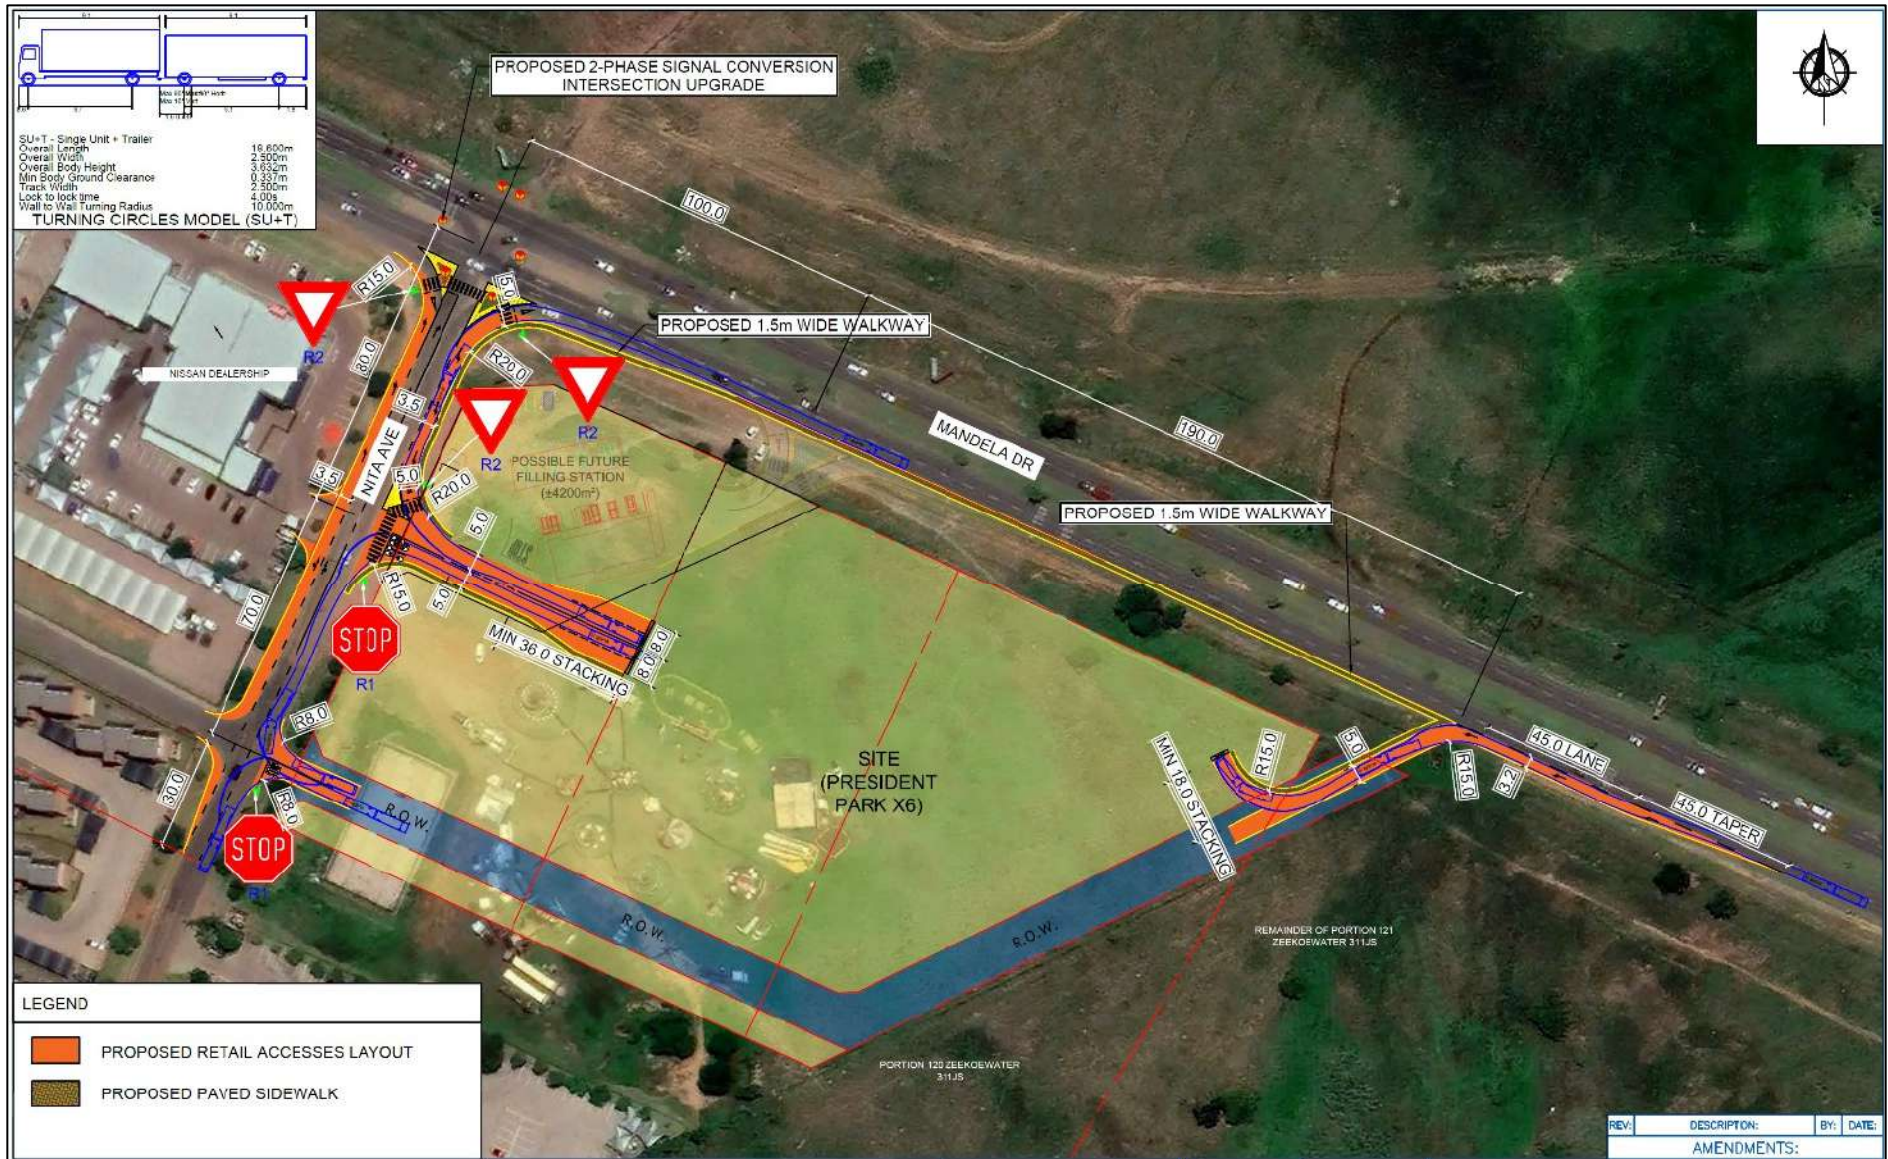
Proposed access layout and intersection upgrades (taken from Van Rooyen, 2020)
